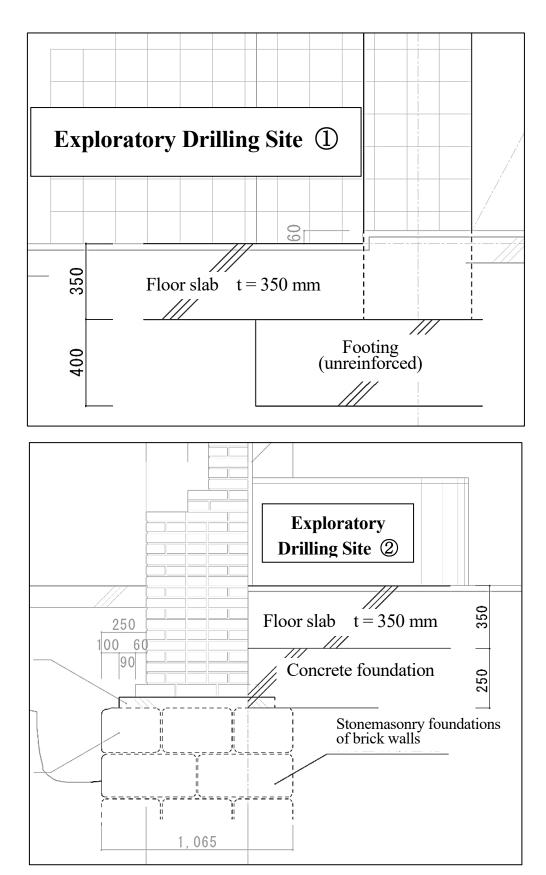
Estimated cross-section views of foundation exploratory drilling sites
